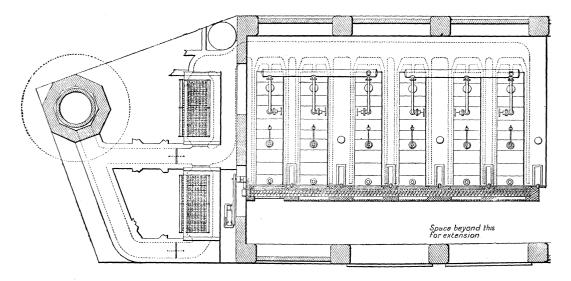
Plan of Boiler House, Liverpool Overhead Railway.
